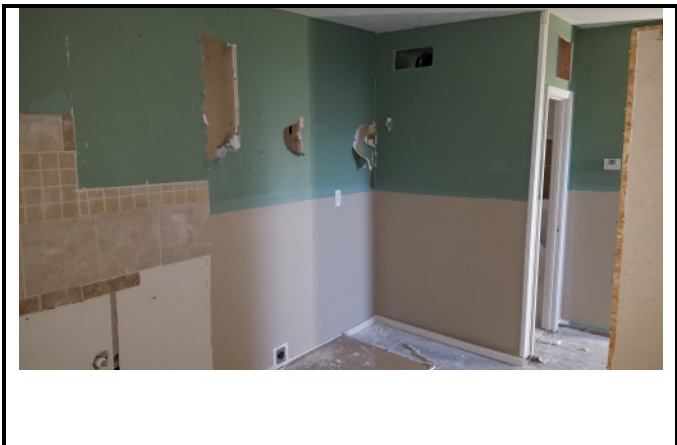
HA2 9x9 Floor Tiles w/Mastic
